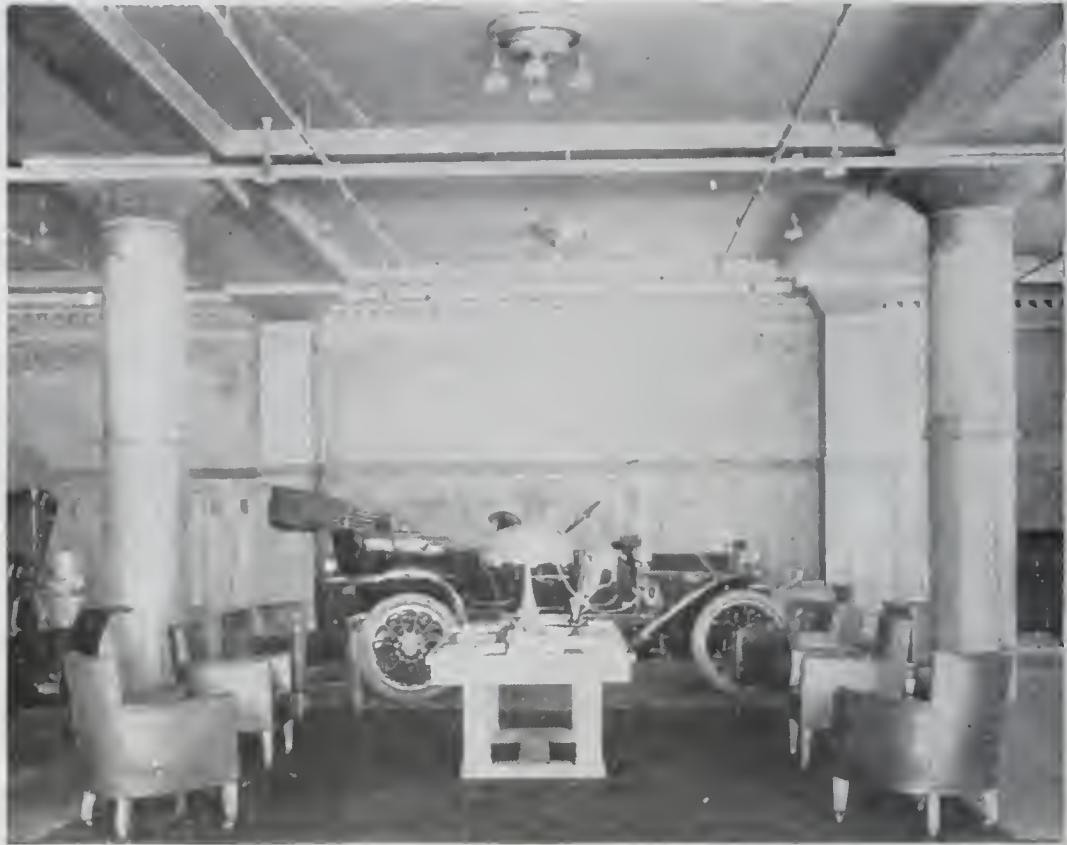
Interior—Studebaker Building, Chicago—Paneled Ceiling Type of Construction.
